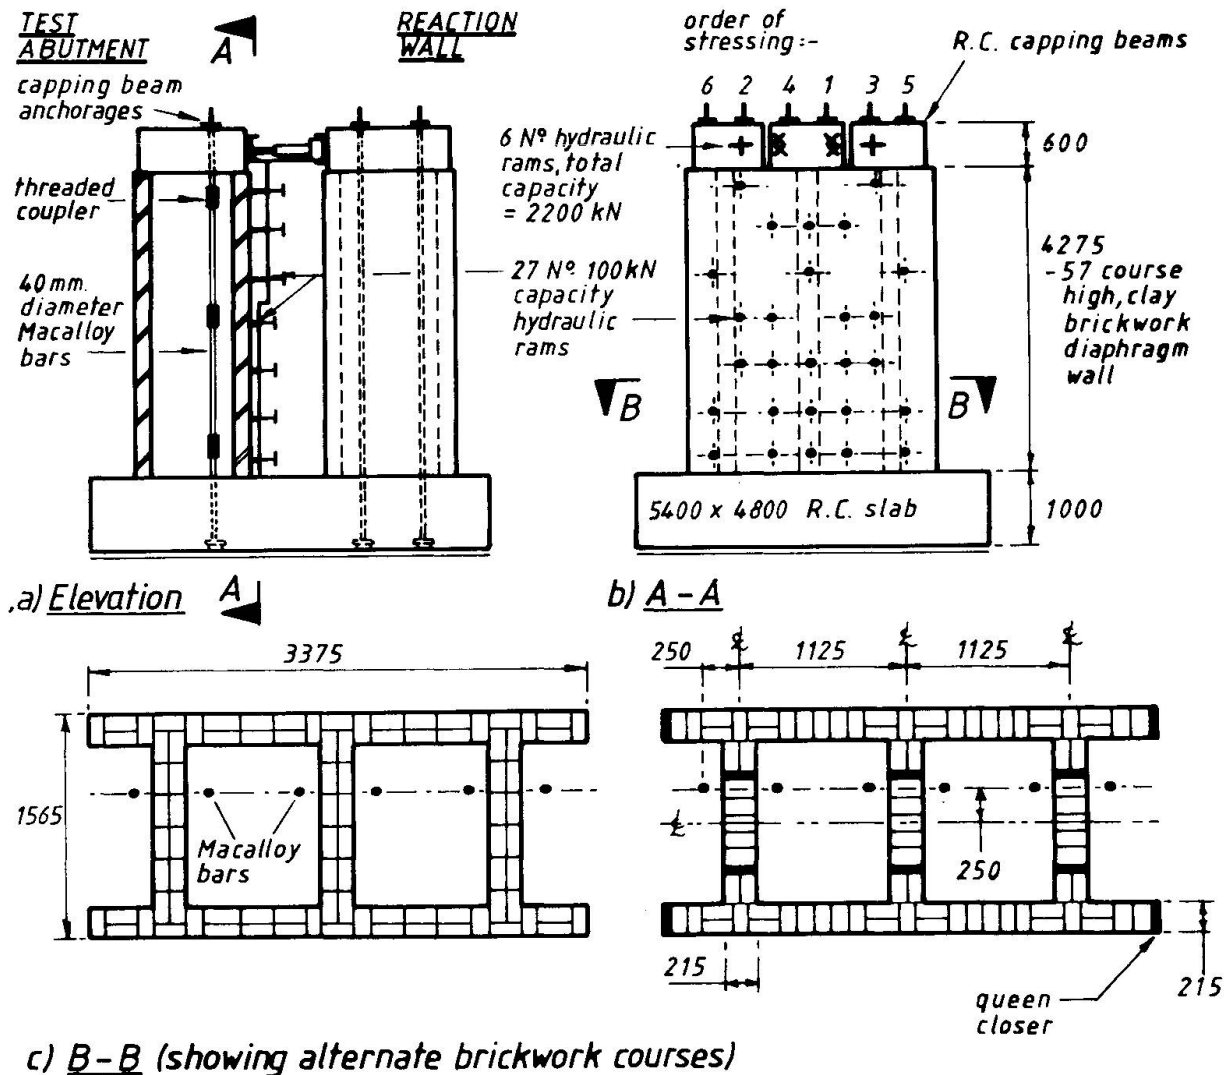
Details of test arrangement (All dimensions are in millimetres)
